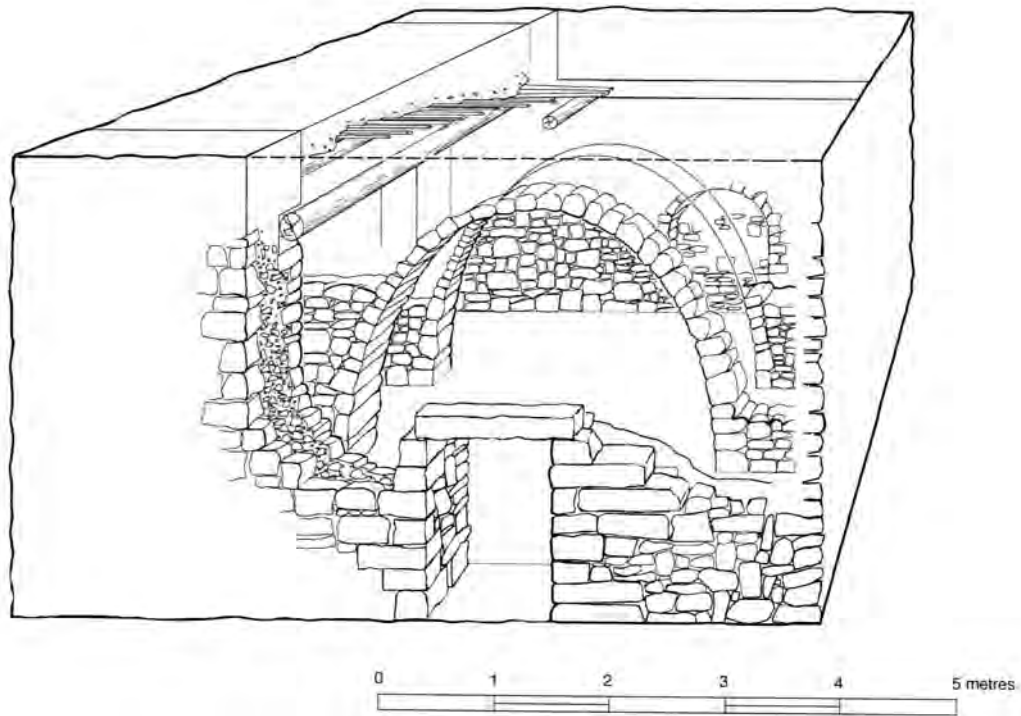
A reconstruction drawing of a "Transverse-Arch House"
